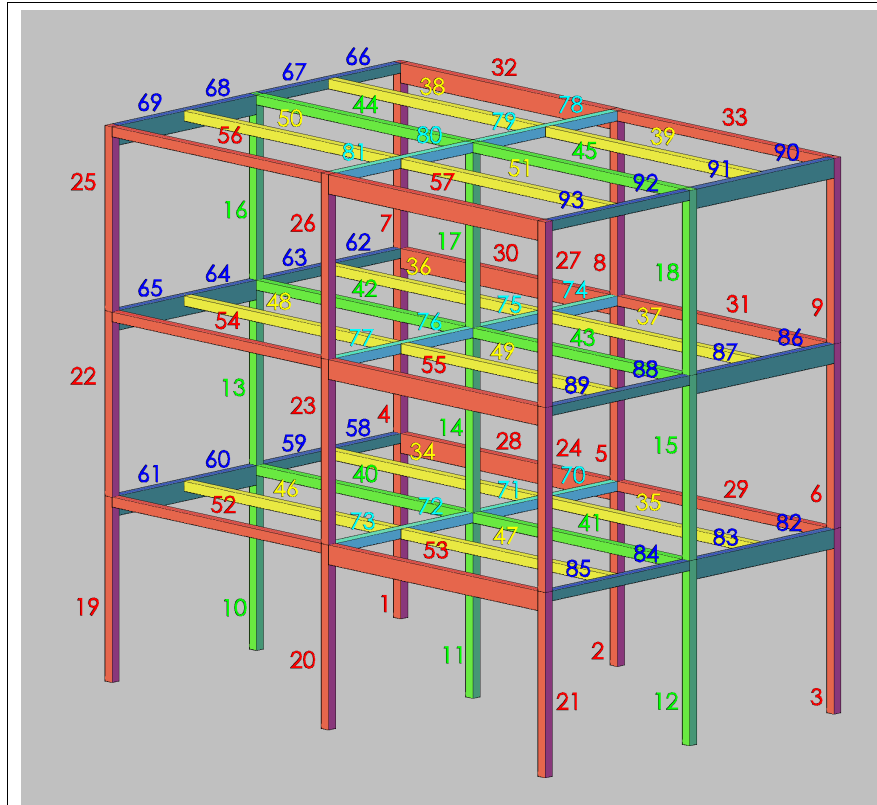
Nomenclature of beams and columns of the three-story building model.
